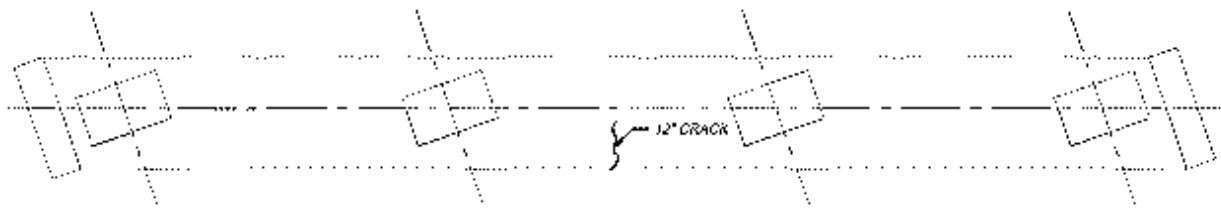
Location of Proposed Concrete Repairs - Rear (South) Abutment Plan MP 182.1
